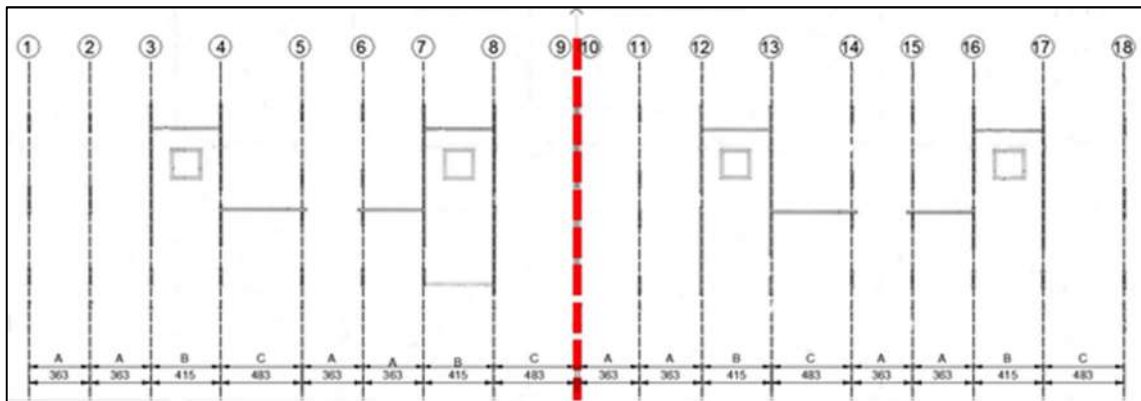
Concrete Frames Building A. Distinct "pillar floor" septa with frame numbers.
